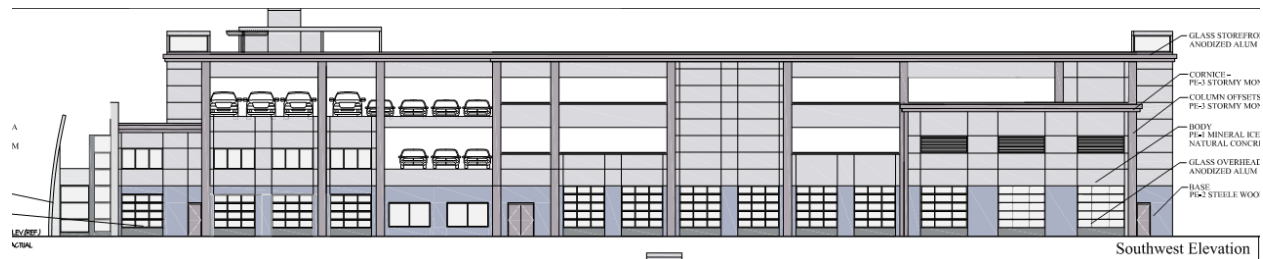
Southwest elevation facing Interstate 90 (Sheet A-3.0)
